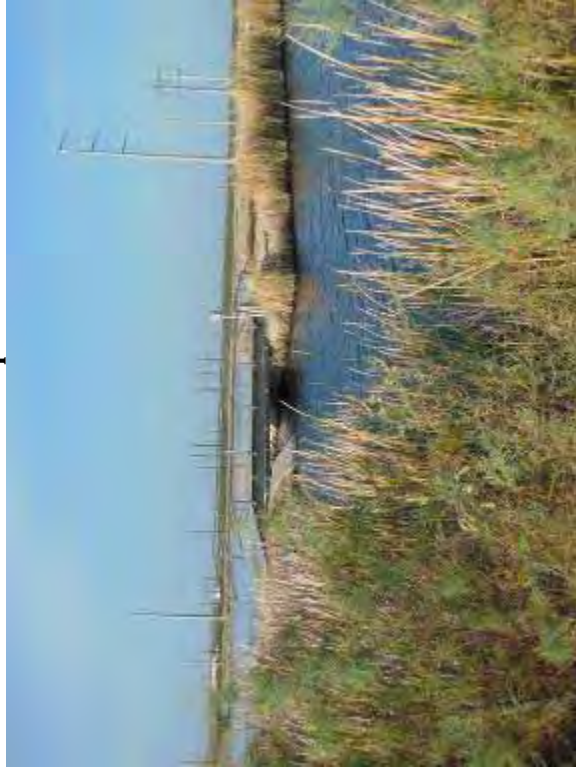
Gate structure between north and south sections of Ash Pond, looking southwest.
